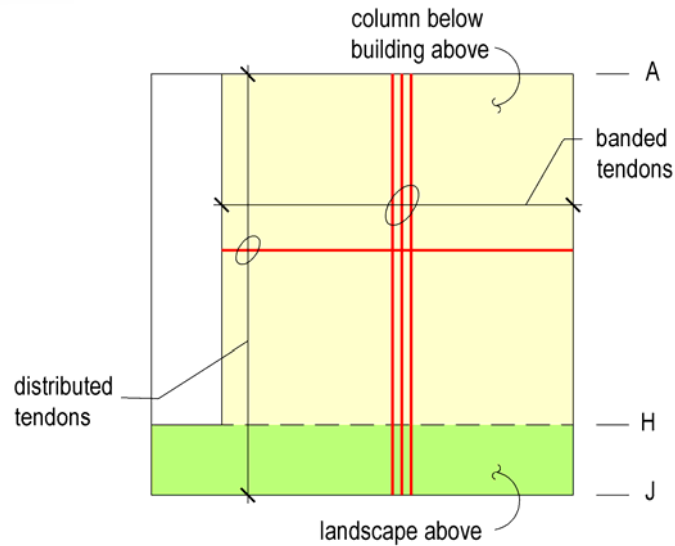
Plan; Arrangement of PT tendons in the podium slab
